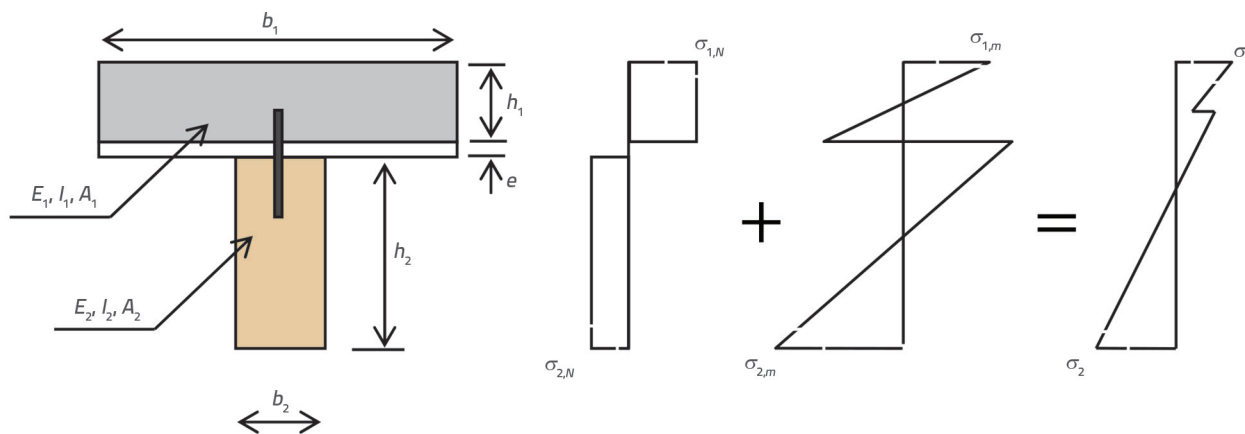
Composite section and stress distribution (E_1 - longitudinal modulus of elasticity of concrete, I_1 - inertia of concrete section, A_1 - section of concrete, E_2 - longitudinal modulus of elasticity of wood, I_2 - inertia of the section of wood, A_2 - section of wood, and e : thickness of the lost formwork
